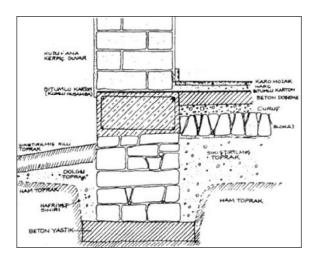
Compressed sand and stone on the top of foundation wall the wooden cages
